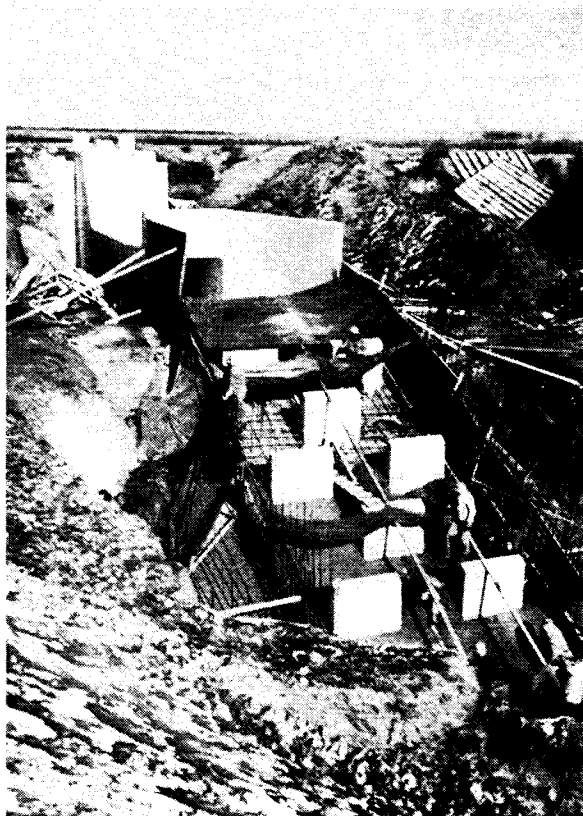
Concrete box culvert with baffled apron drop at outlet. P-707-729-1947
